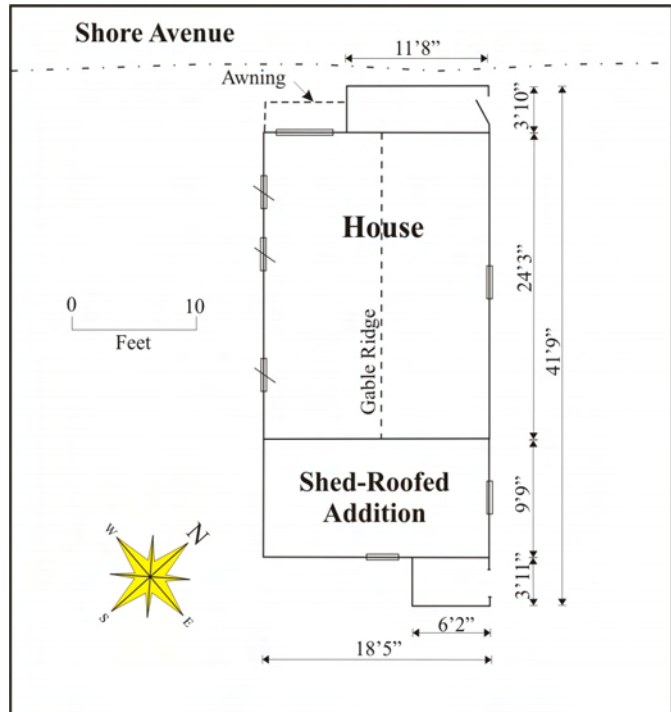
Plan of the Leslie Williams House at 516 Shore Avenue.
